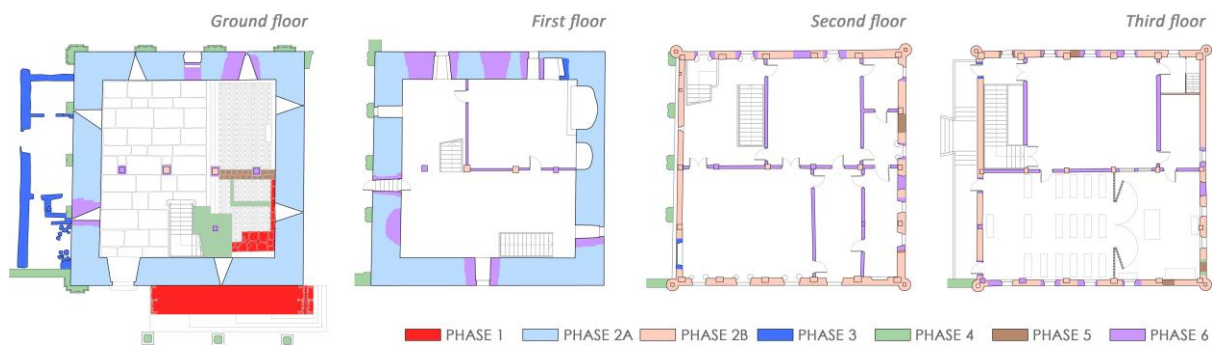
Construction phases of the Loyola Tower Palace, Floors
